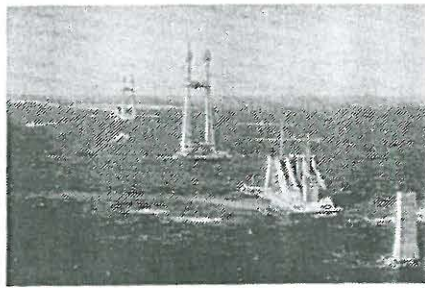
Storebælt sliding problem for anchor blocks on clay till (after Steenfelt, 1992)
